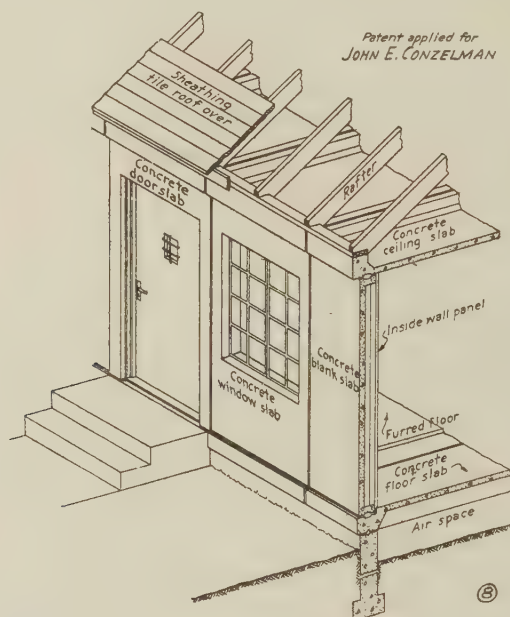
CONZELMAN UNIT CONSTRUCTION
